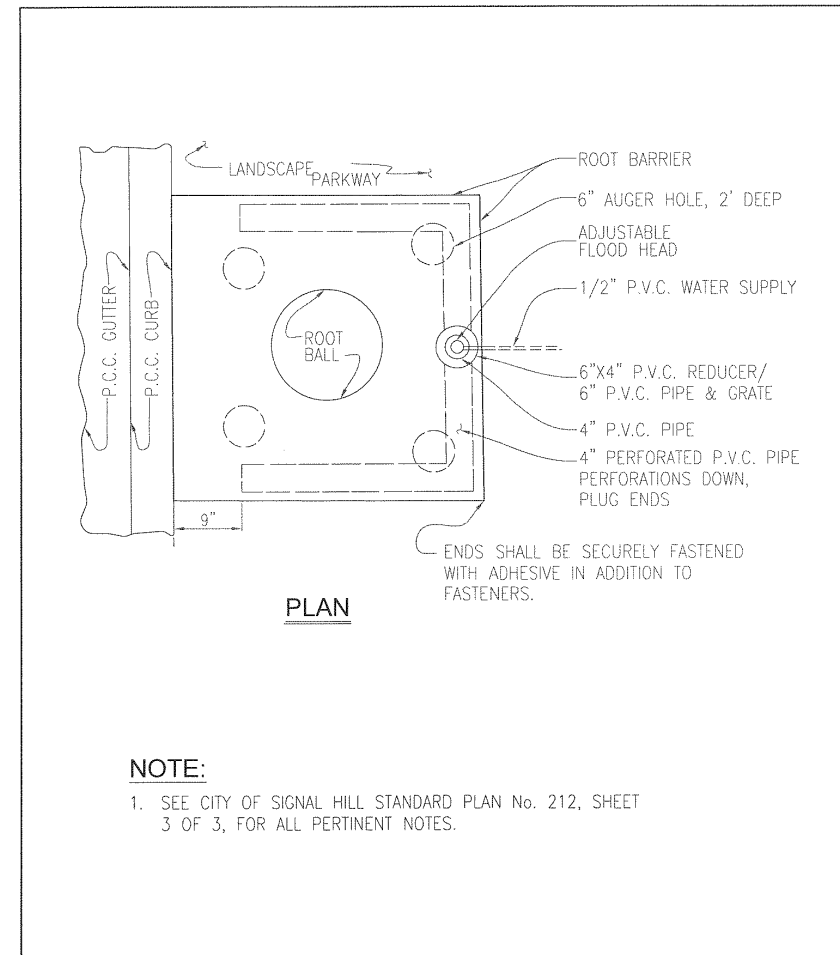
Signal Hill Public Works Parkway Street Tree Planting Detail, Notes (212)
